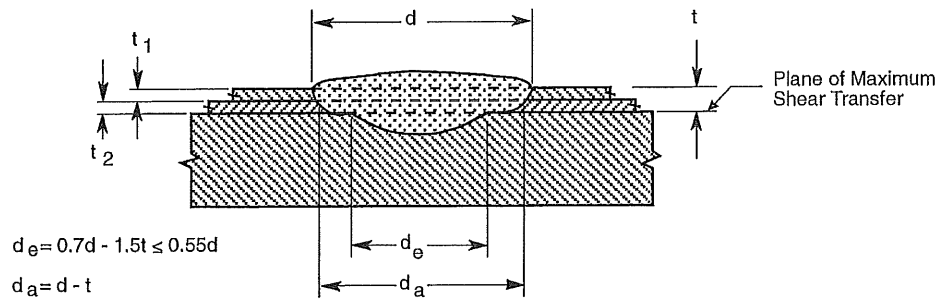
Arc Spot Weld – Double Thickness of Sheet
